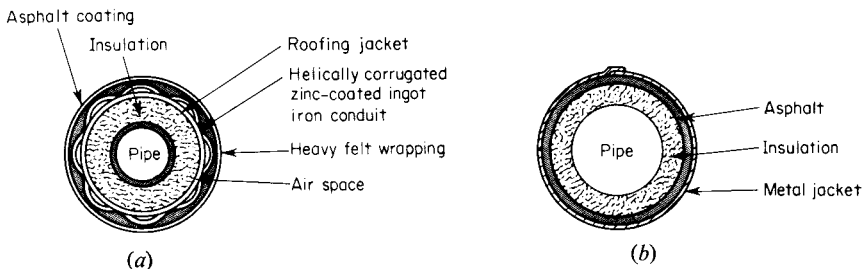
Prefabricated conduits for underground steam pipes: (a) coated and wrapped corrugated conduit; (b) poured asphalt protects thermal insulation.
